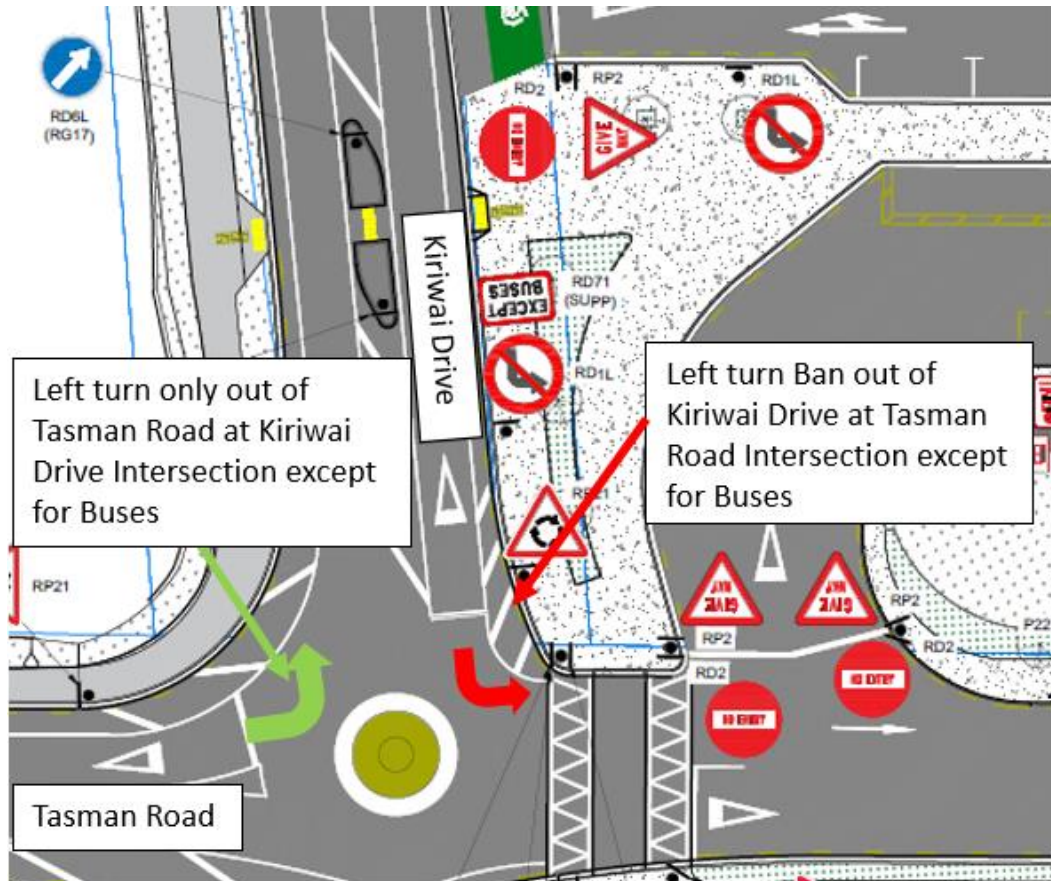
New Roundabout on Tasman Road and proposed left turn ban out of Kiriwai Drive
